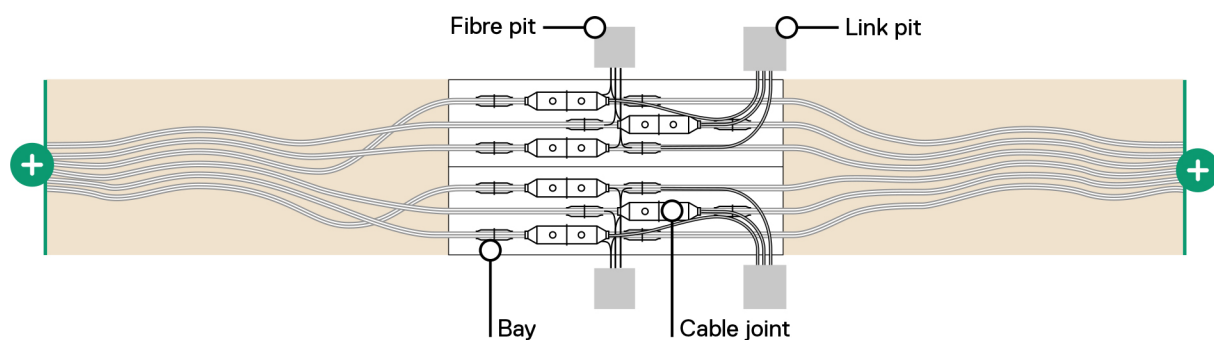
Joint bay locations within the underground cable system (five circuits shown)
